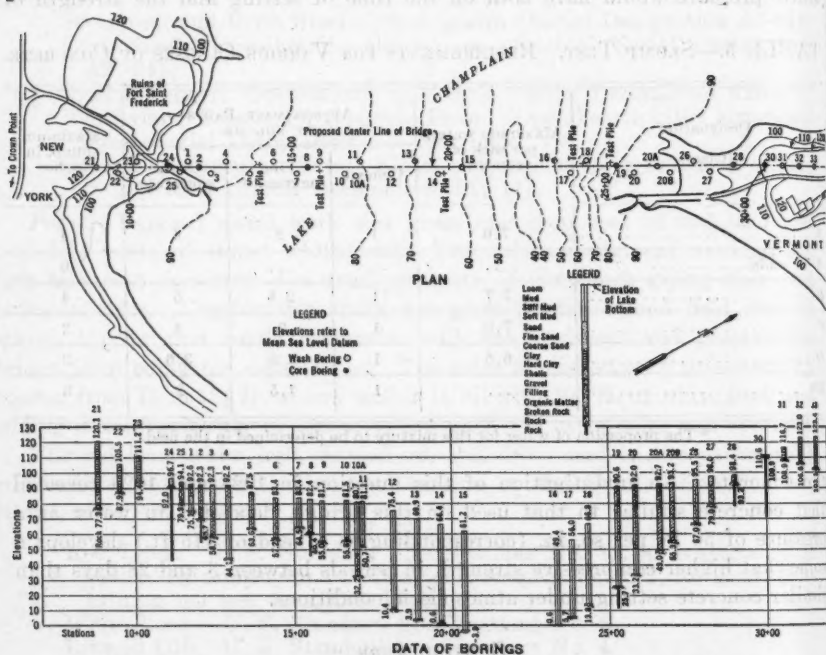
RECORD OF BORINGS MADE IN 1927, LAKE CHAMPLAIN BRIDGE
